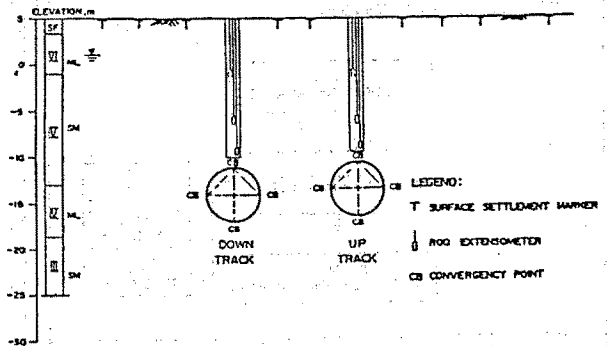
A Typical Monitoring Instrumentation Layout for a Tunnel Section
